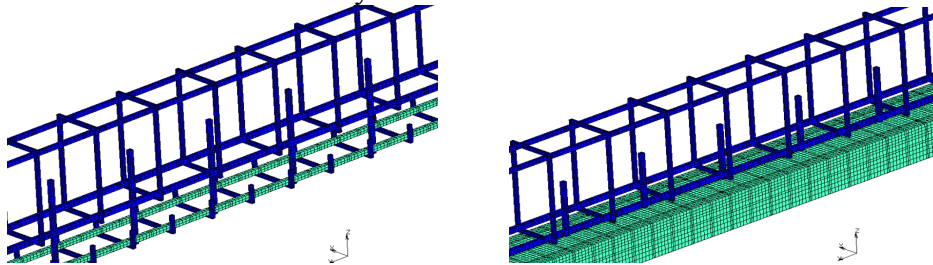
The models of reinforcements, stirrups and anchorage rods for strengthened beams
